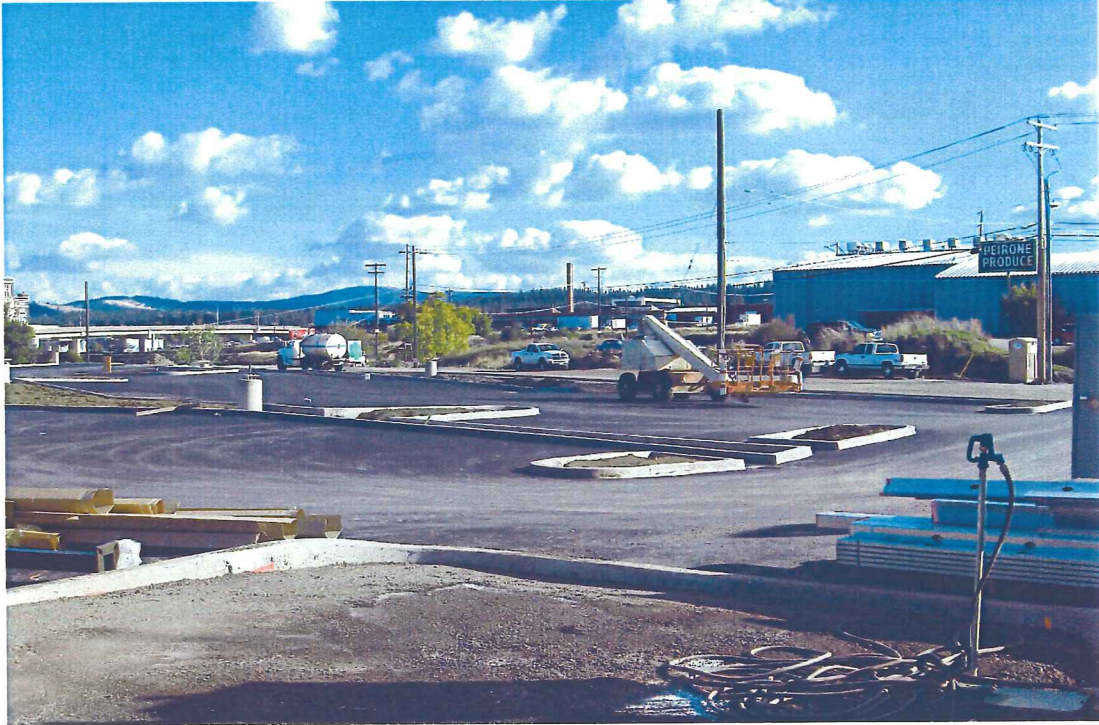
View to west of eastern property imported fill, storm water management, asphalt parking, and landscape improvements.
